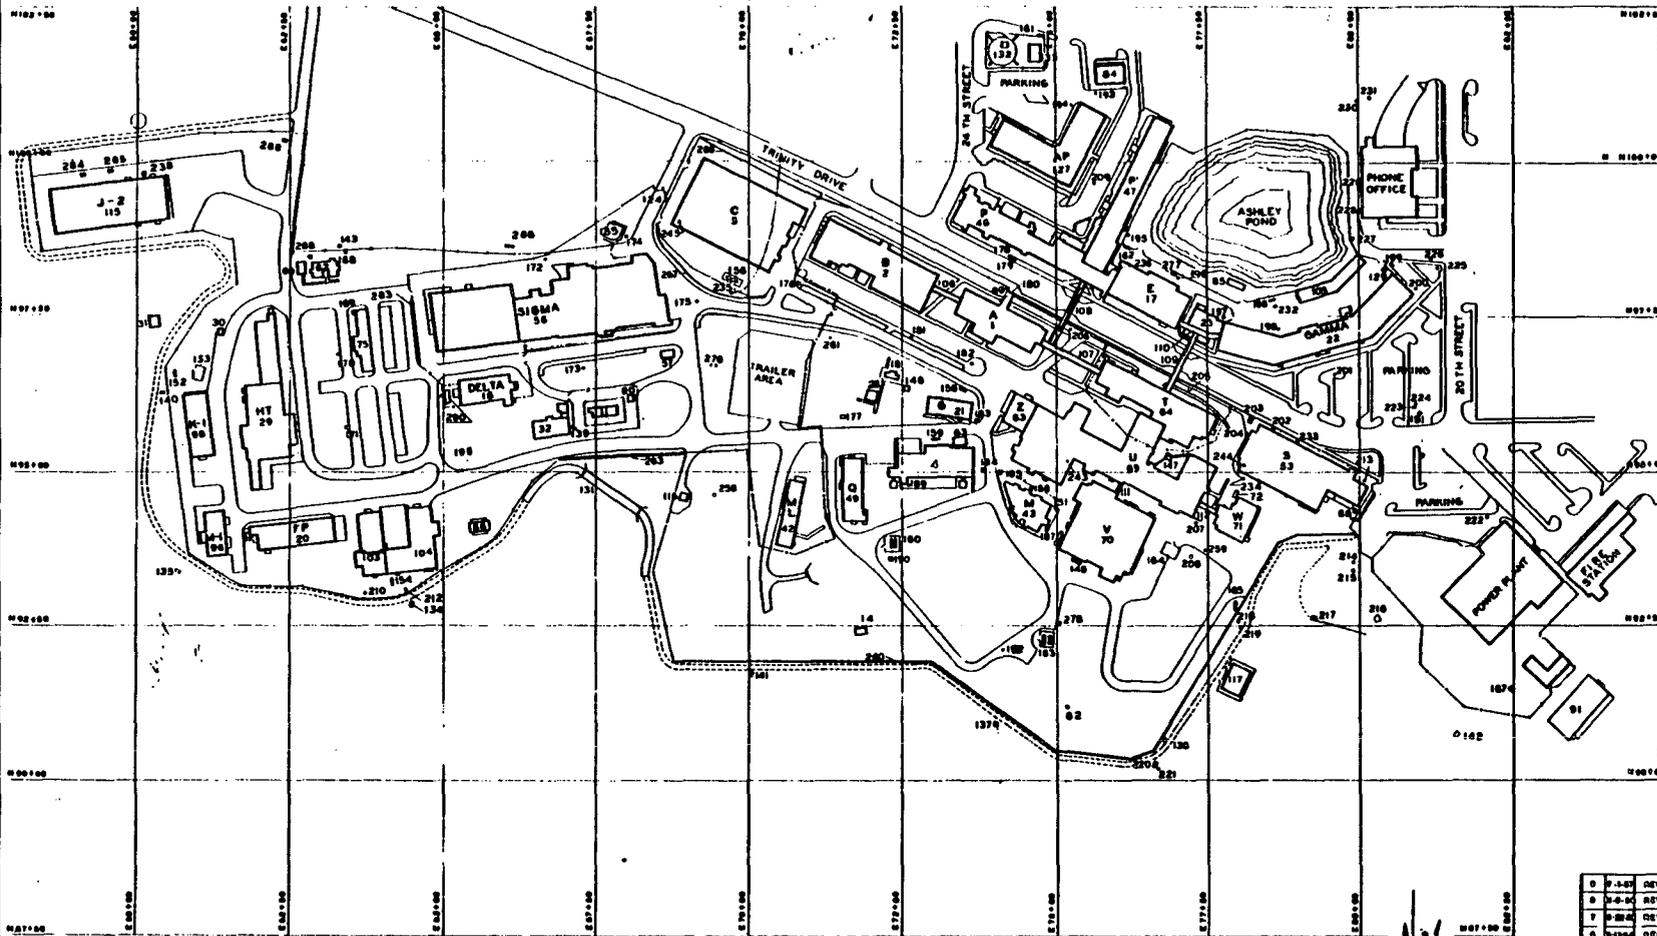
Structure Location Plan for TA-1 - Main Technical Area (1954 Drawing from the LANL Technical Area Structure Location Plans)
